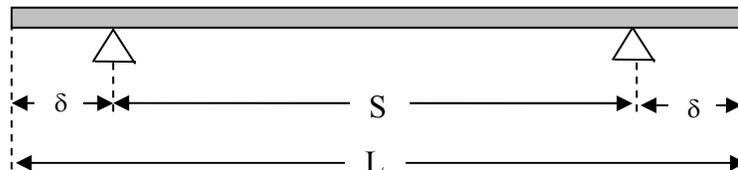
A simply supported beam with symmetric overhang (L - beam length, S - span between the two support points, δ - overhang length)
